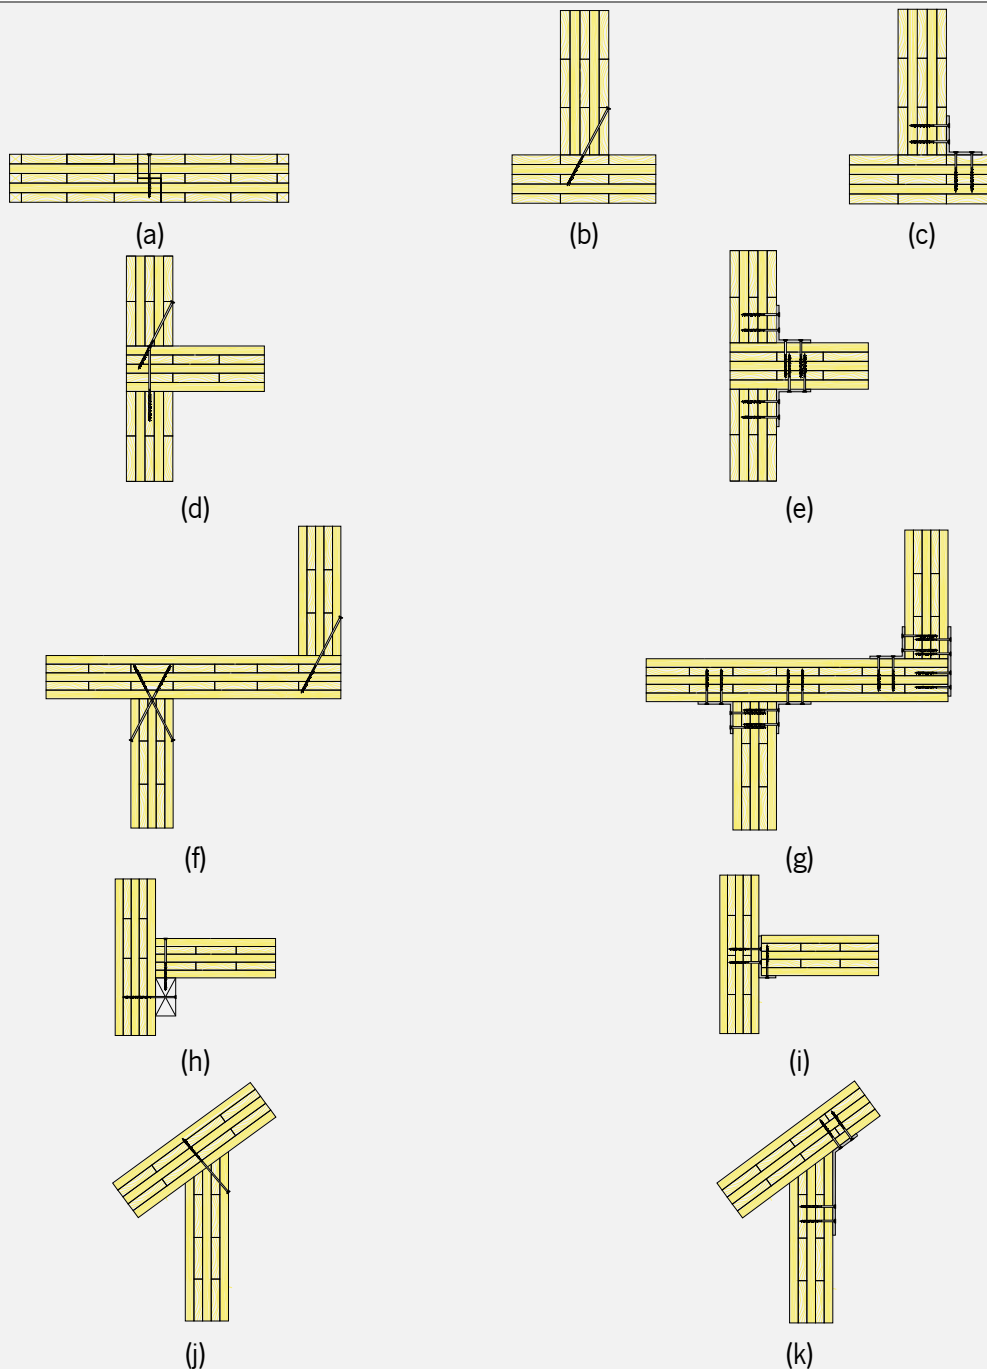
4. Examples of connection between CLT elements. (a) connection between floor panels with self-tapping screws, (b) connection between wall panels with self-tapping screws, (c) connection between wall panels with screws and steel plates, (d) connection between floor and walls elements with self-tapping screws in a platform construction system, (e) connection between floor and walls elements with screws and steel plates in a platform construction system, (f) connection used to assemble balconies with self-tapping screws, (g) connection used to assemble balconies with screws and steel plates, (h) connection between floor and walls elements with self-tapping screws in a balloon construction system, (i) connection between floor and walls elements with screws and steel plates in a balloon construction system, (j) connection between roof and wall elements with self-tapping screws, (k) connection between roof and wall elements with screws and steel plates.
